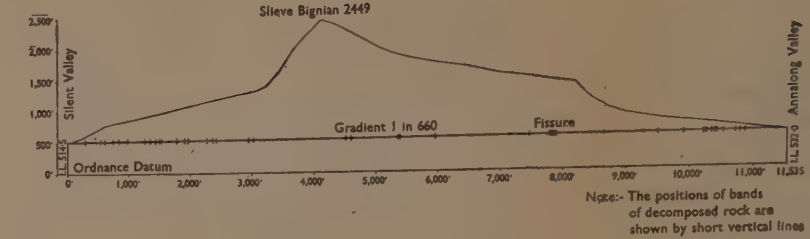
LONGITUDINAL SECTION OF TUNNEL
